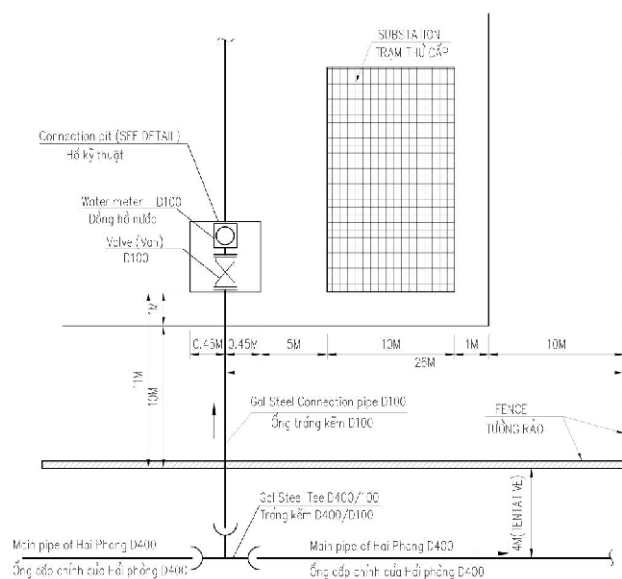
Plan of Branch Pipe to Connection Pit in the Public Related Area
